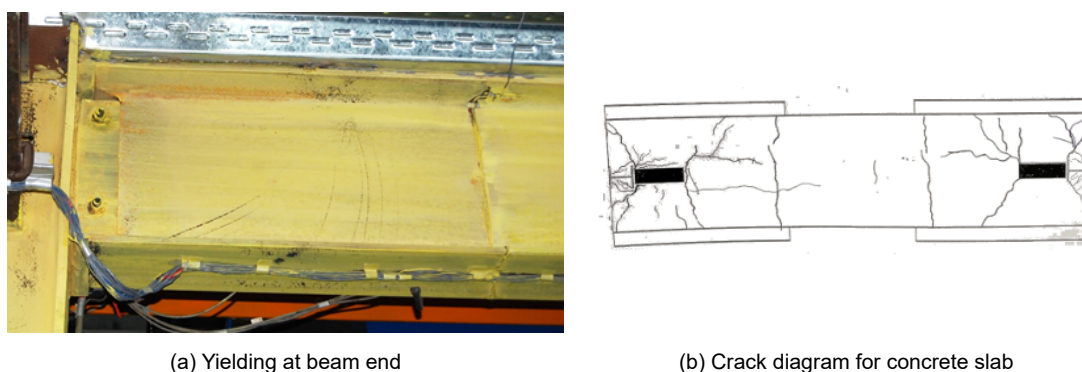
Observed beam damage in Specimen TNCBF2-D-HSS at 0.8% beam deflection
